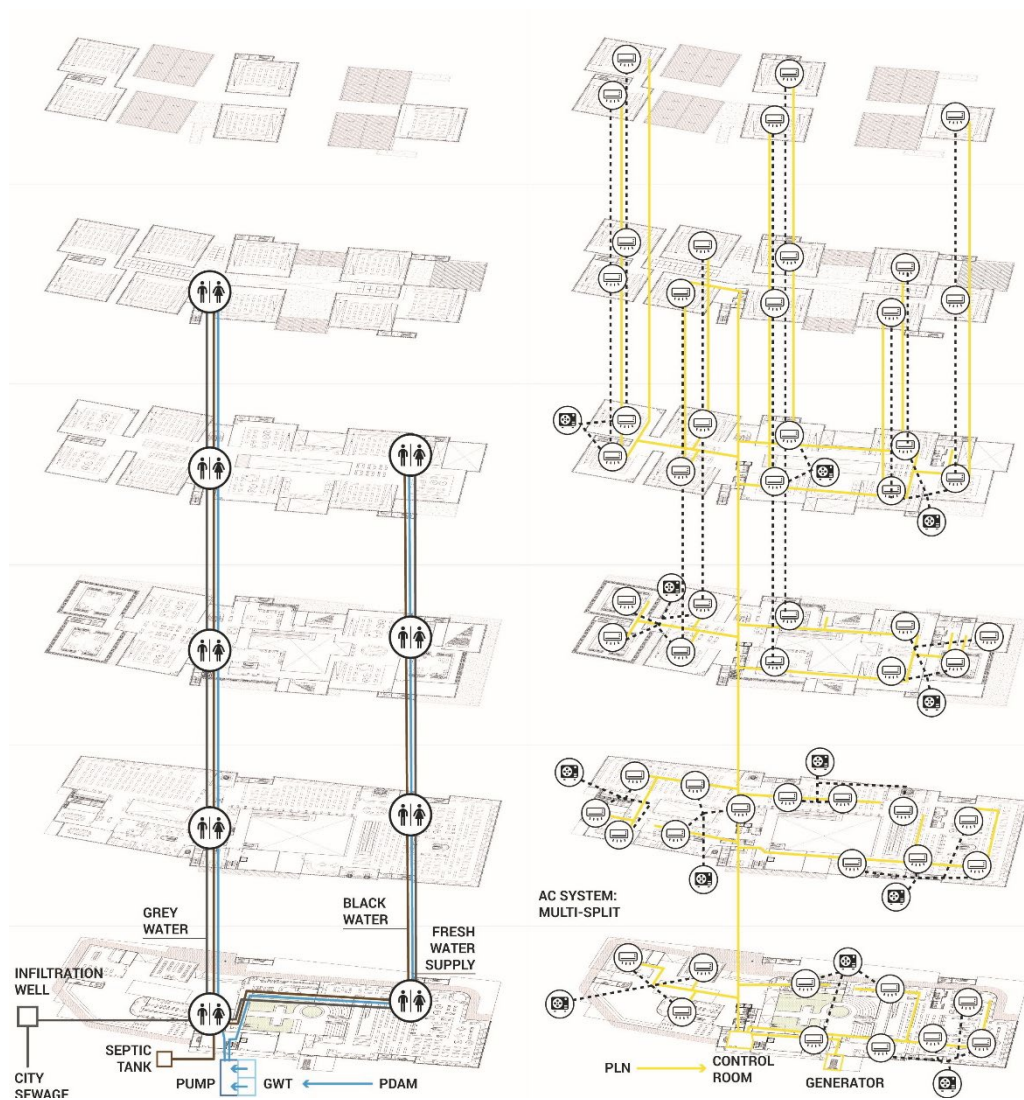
Utility diagram: [left] Water treatment plan and [right] electrical system plan.
